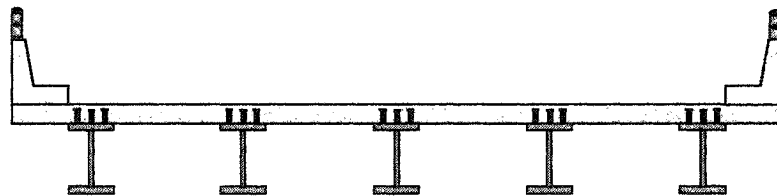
Cross-Section of a Typical Slab-on-Girder Bridge
